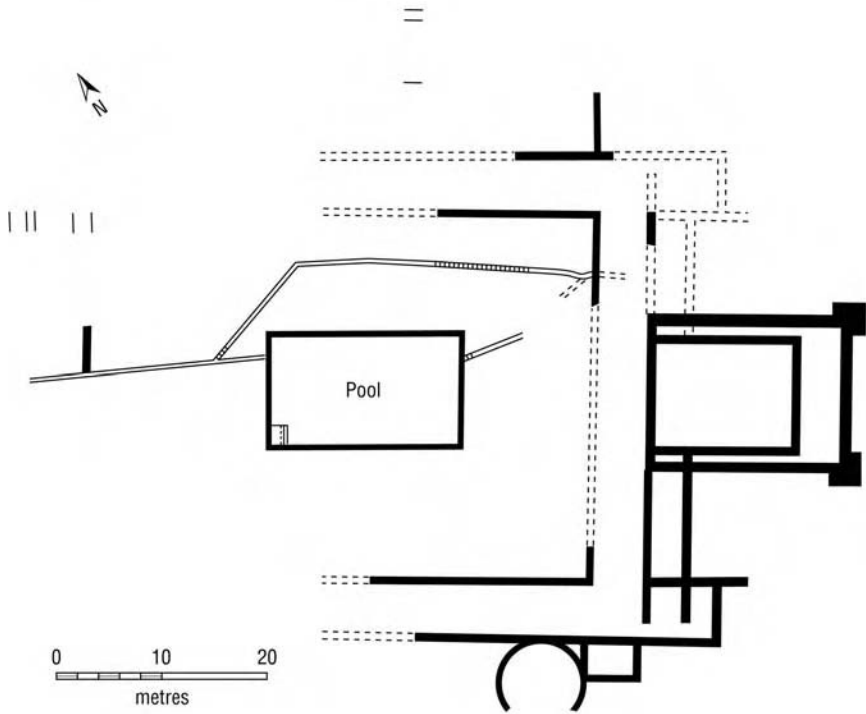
Plan of the first Coupéré building (after Sablayrolles in *Collectif* 2002)
